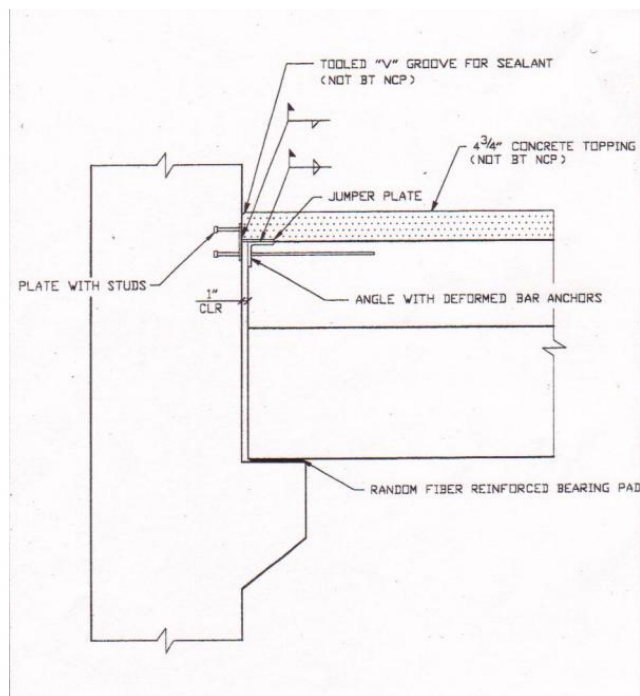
Precast Column to Beam Connection (image provided by Nitterhouse Concrete Products)
